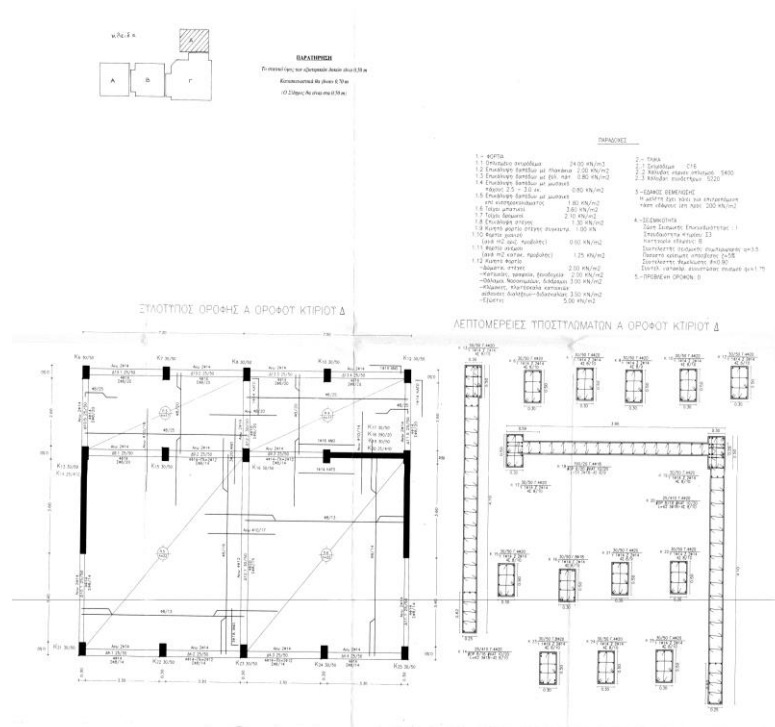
Indicative blueprint of a reinforced concrete school building in the area of Alexandroupolis, designed in late 90s.
